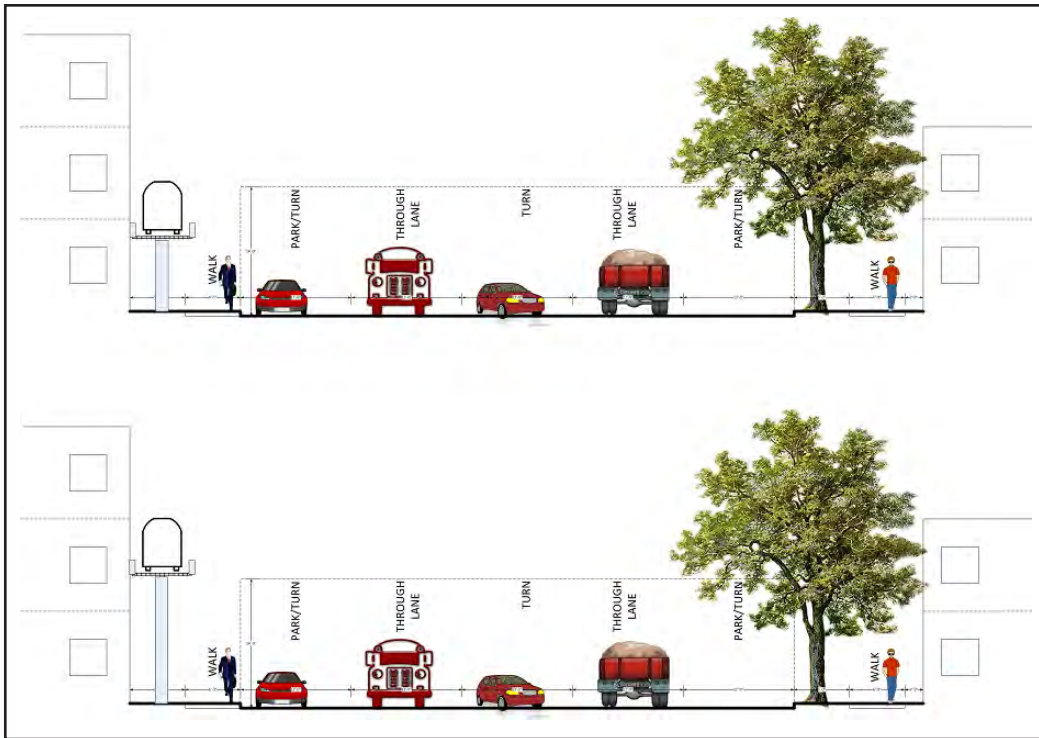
Urban Road Section – Sidewalk, Adjacent to Building
